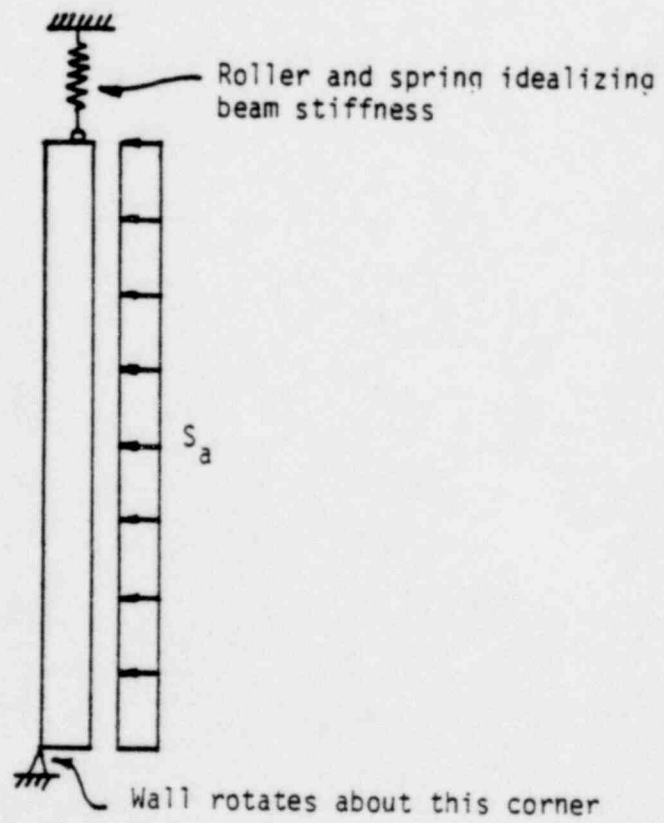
RIGID BODY WALL ROCKING WITH FLEXIBLE ROOF BEAM INTERFERENCE CONSIDERED
